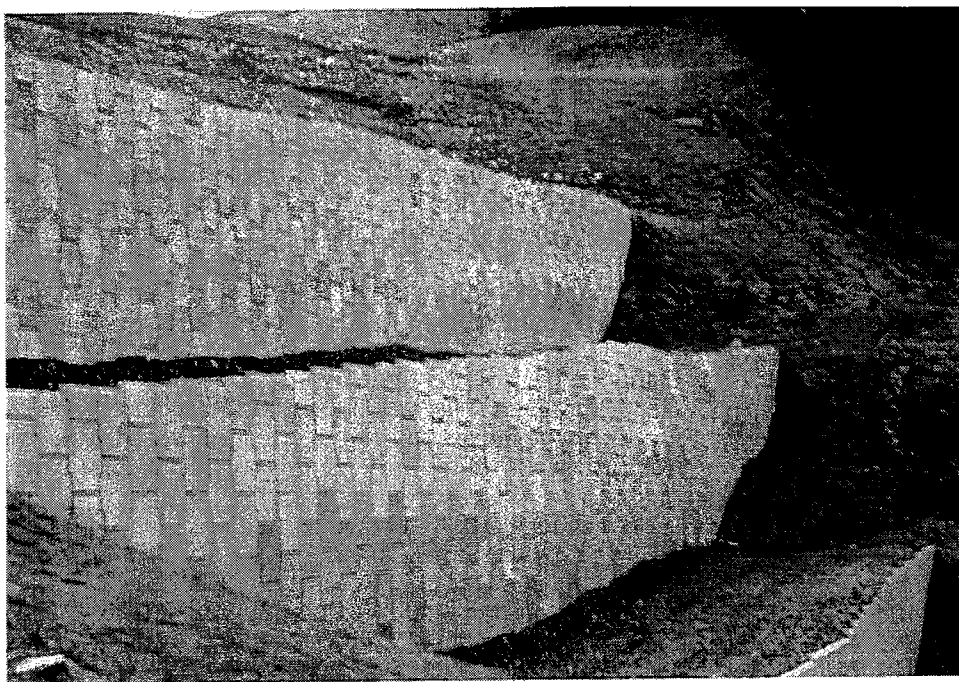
Several Mechanically Stabilized Earth Walls (Reinforced Earth, Inc.) Were Constructed to Prevent Side Hill Fills Extending Down Slope.
